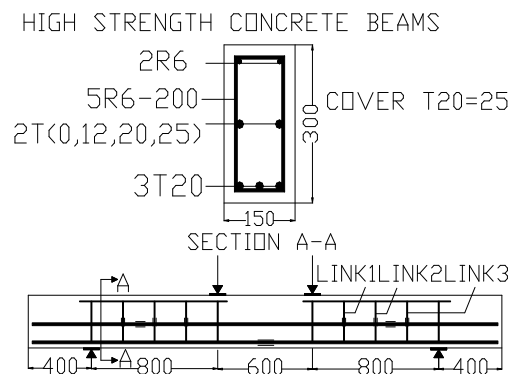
Reinforcement details and position of strain gauges for the High Strength Concrete test specimen
